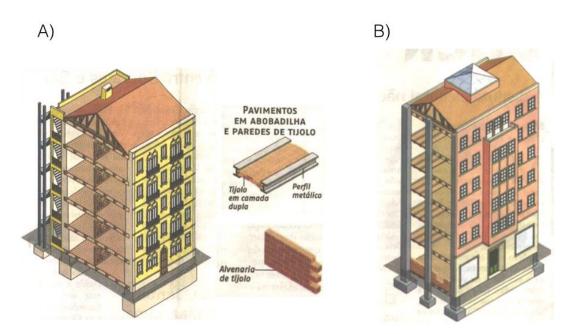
A) Gaioleiro building B) Mixed construction building (Branco et al., 2012)
